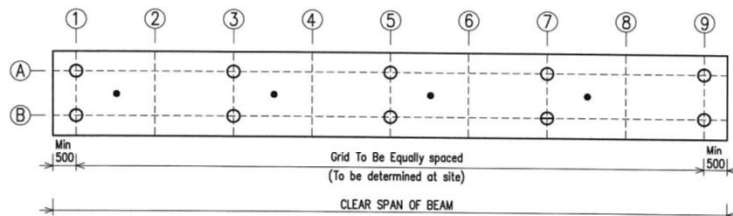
TYPICAL MATERIAL TEST PLAN AT BEAM SOFFIT
